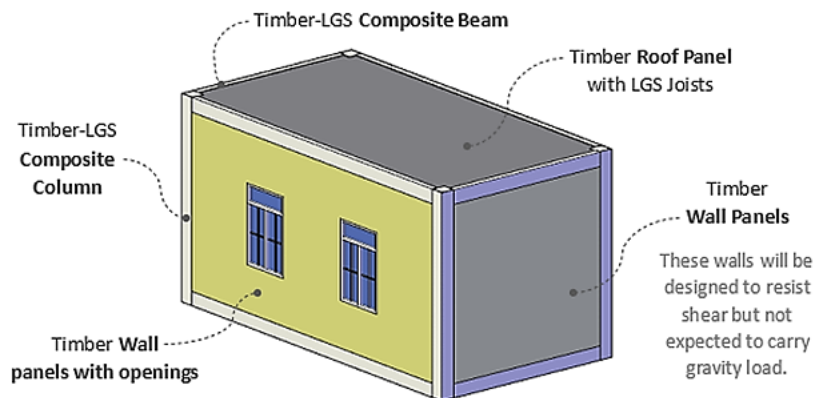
Proposed Tim-LGS Modular Building Unit. Source: (Authors 2024)
